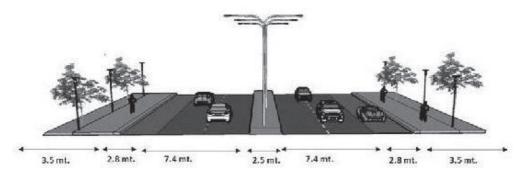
Cross Section of 30m wide Sub-Arterial Road
